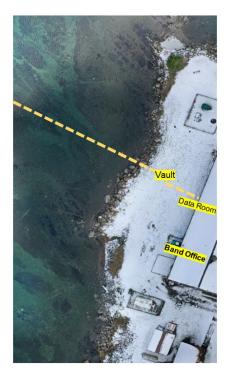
Proposed Cable Alignment at Kitkatla Project Site Shown in Yellow (March 14, 2021).
